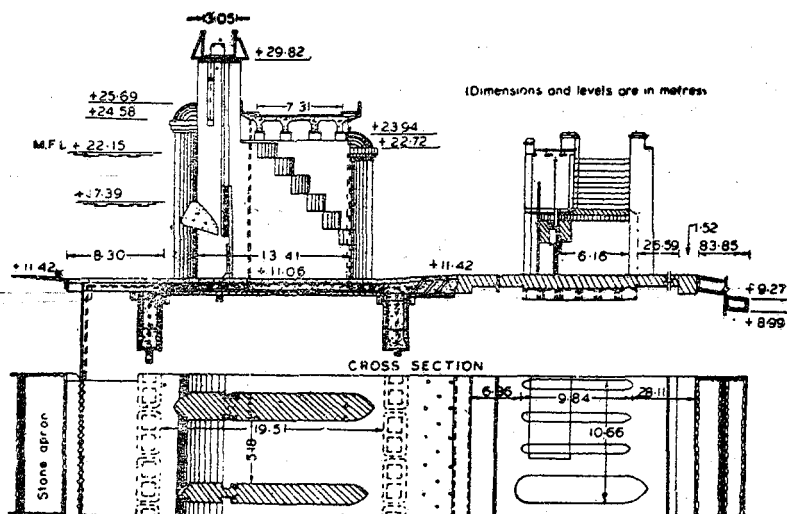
(d) Plan (Vijaywada side) of Prakasm Barrage.
